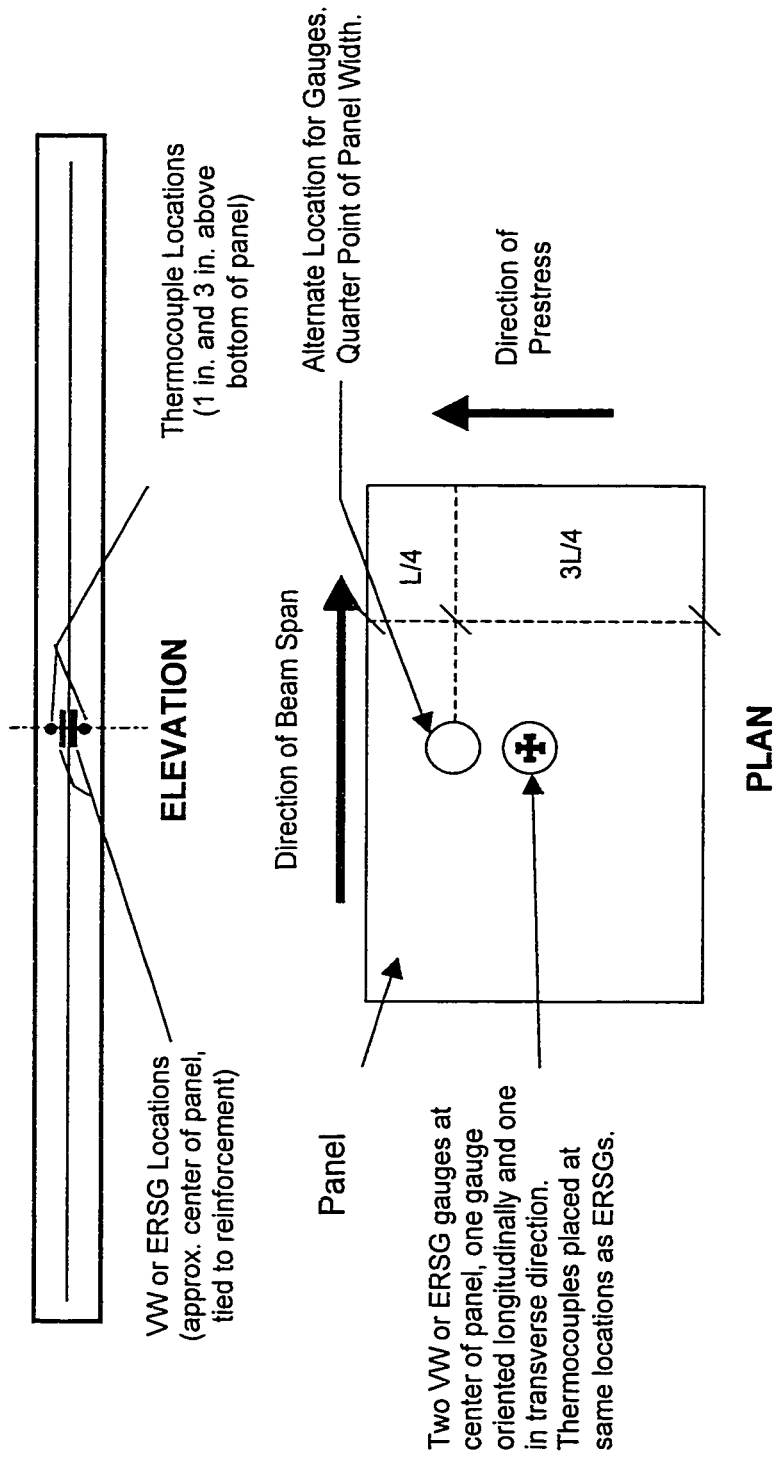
Typical Instrumentation Scheme for Precast Deck Panels
